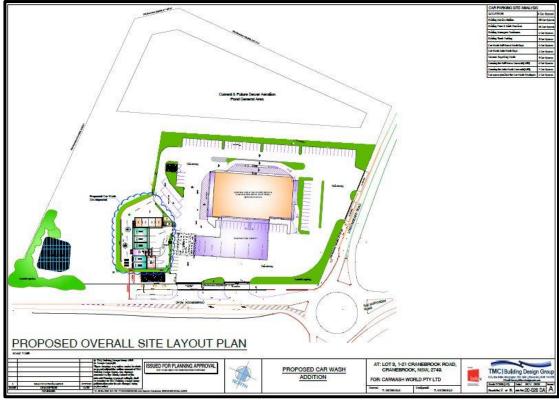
Proposed Car Wash Location (Plan used courtesy of TMC Building Design Group)
